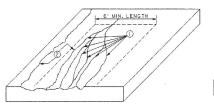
DETAIL OF TRANSVERSE CONSTRUCTION AND CONTRACTION JOINTS & LONGITUDINAL CONSTRUCTION JOINT (NEW PAVEMENT AND PATCHES)
